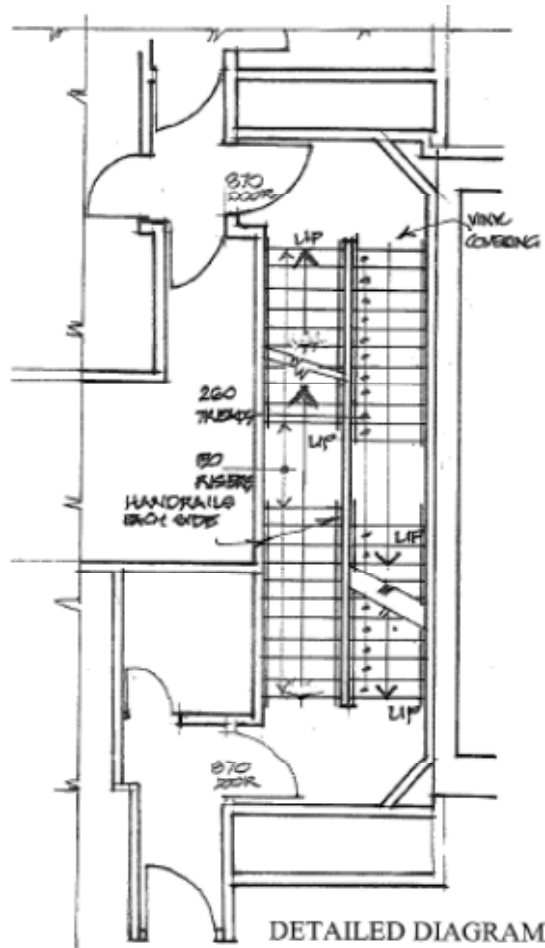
Majestic Stair Plan (MacLennan, 2011)
